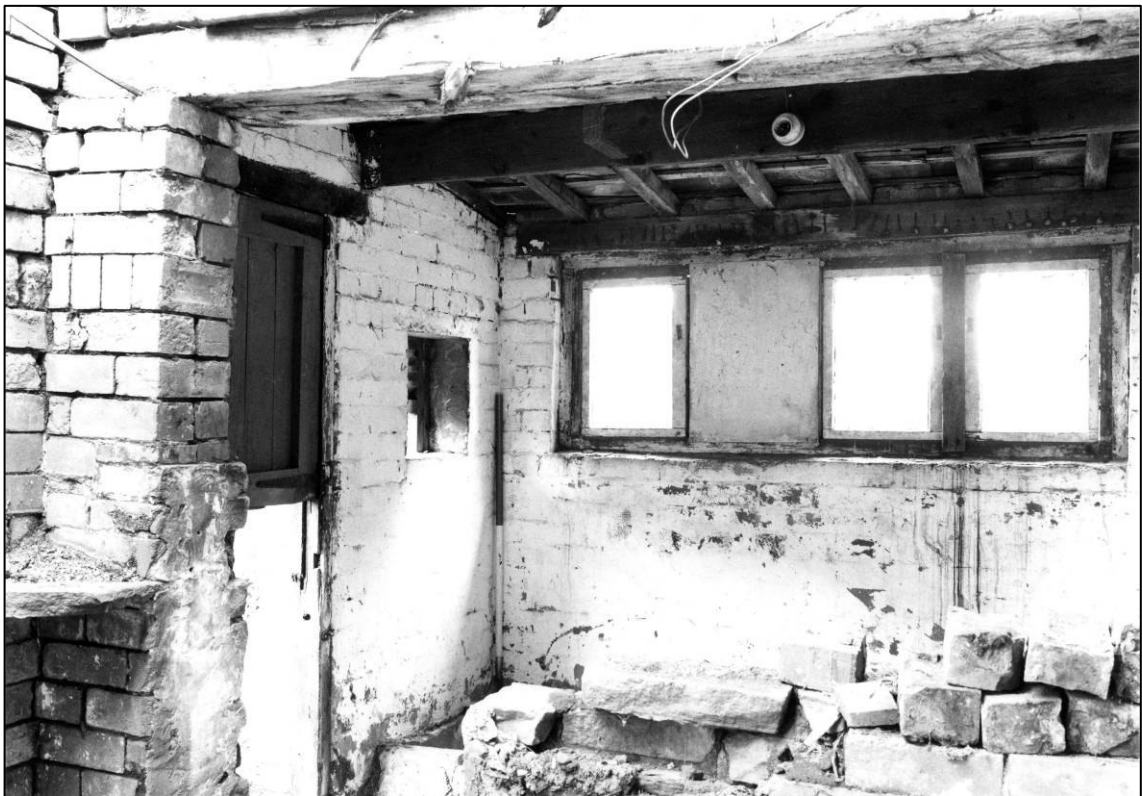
Building N1, interior east cell, looking NE (photo 2/10).
